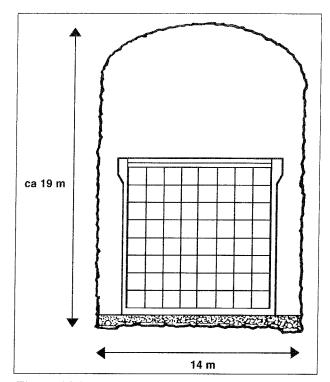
Schematic cross-section of SFL 3 (or SFL 5). The inner concrete construction, containing the waste packages, is standing on a bed of gravel. The void space between the inner construction and the rock is, finally, backfilled with crushed rock /13-4/.
